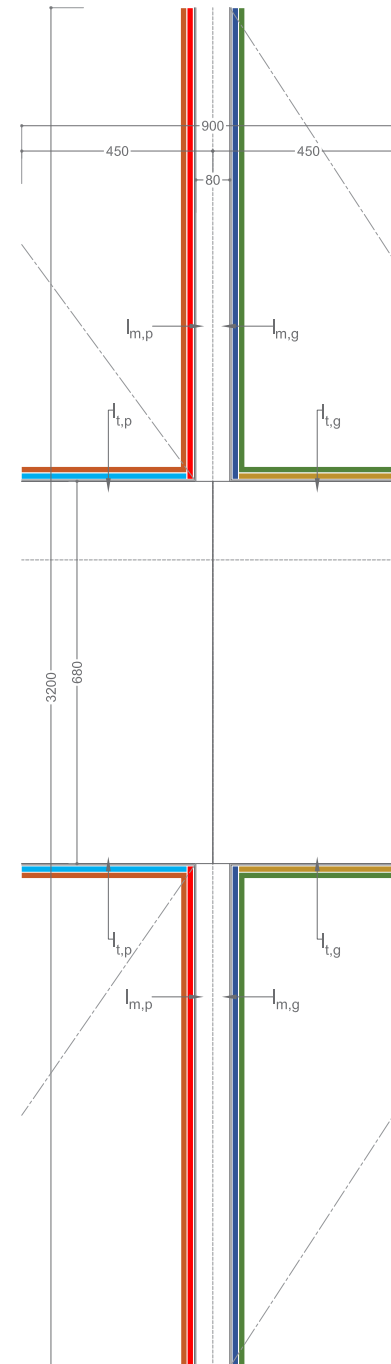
Enlarged elevation showing lengths of facade components of typical wall for proposed case (Source – Author)
